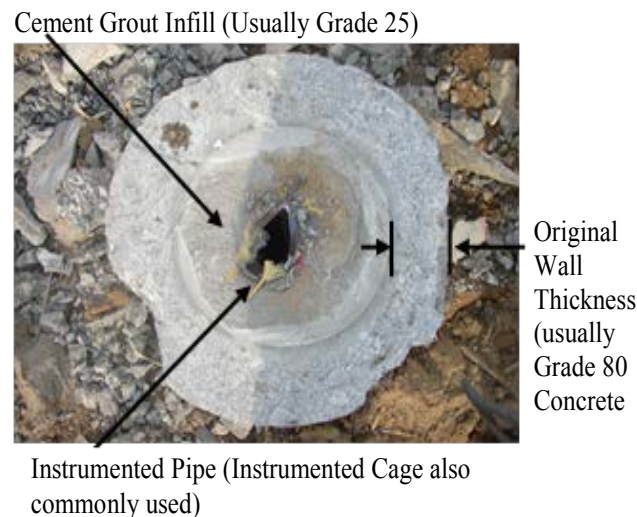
(b) - Section of instrumented spun pile after cement grout infilling in Approximate Method
